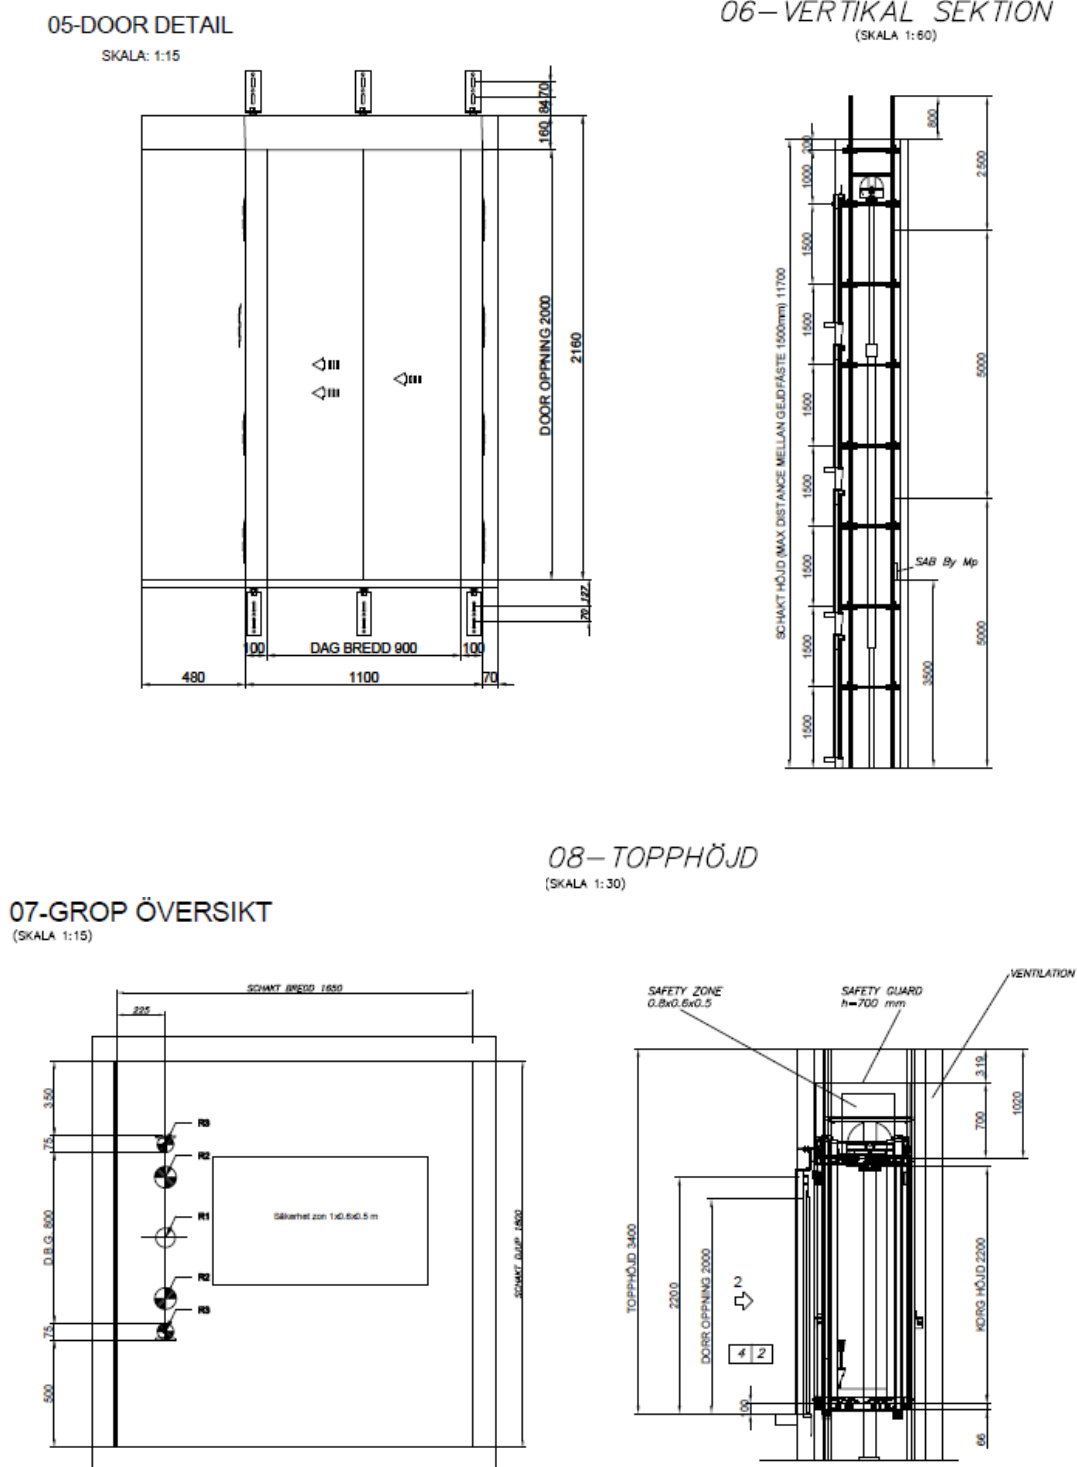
Plan and construction drawings of the MP H-01 lift
